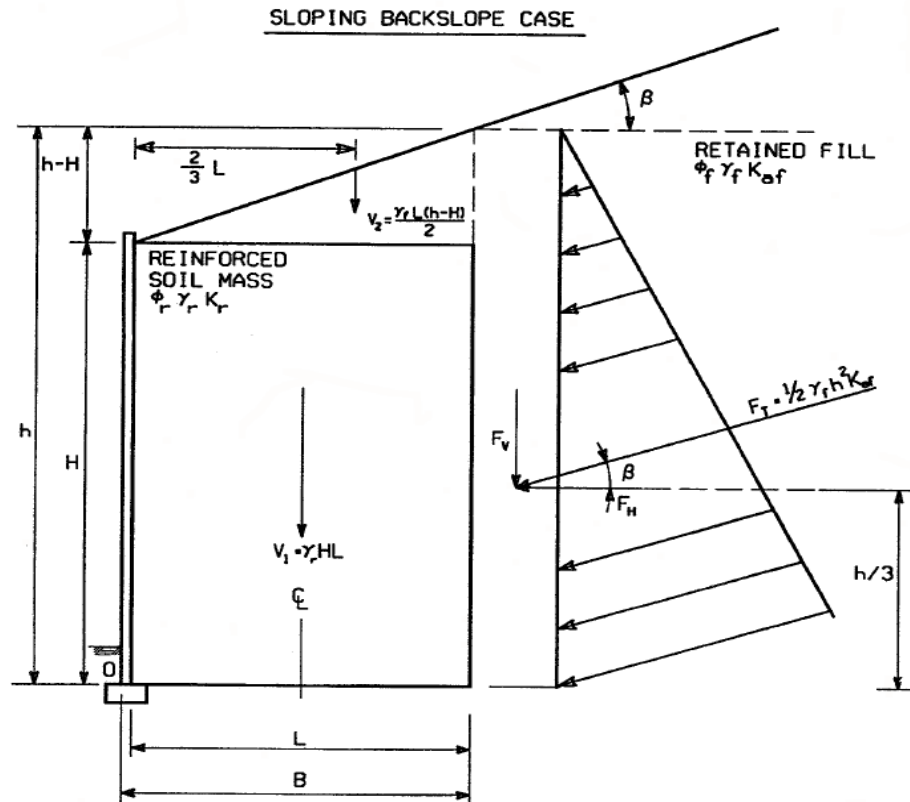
Representation of the forces acting on a retaining wall [13]
